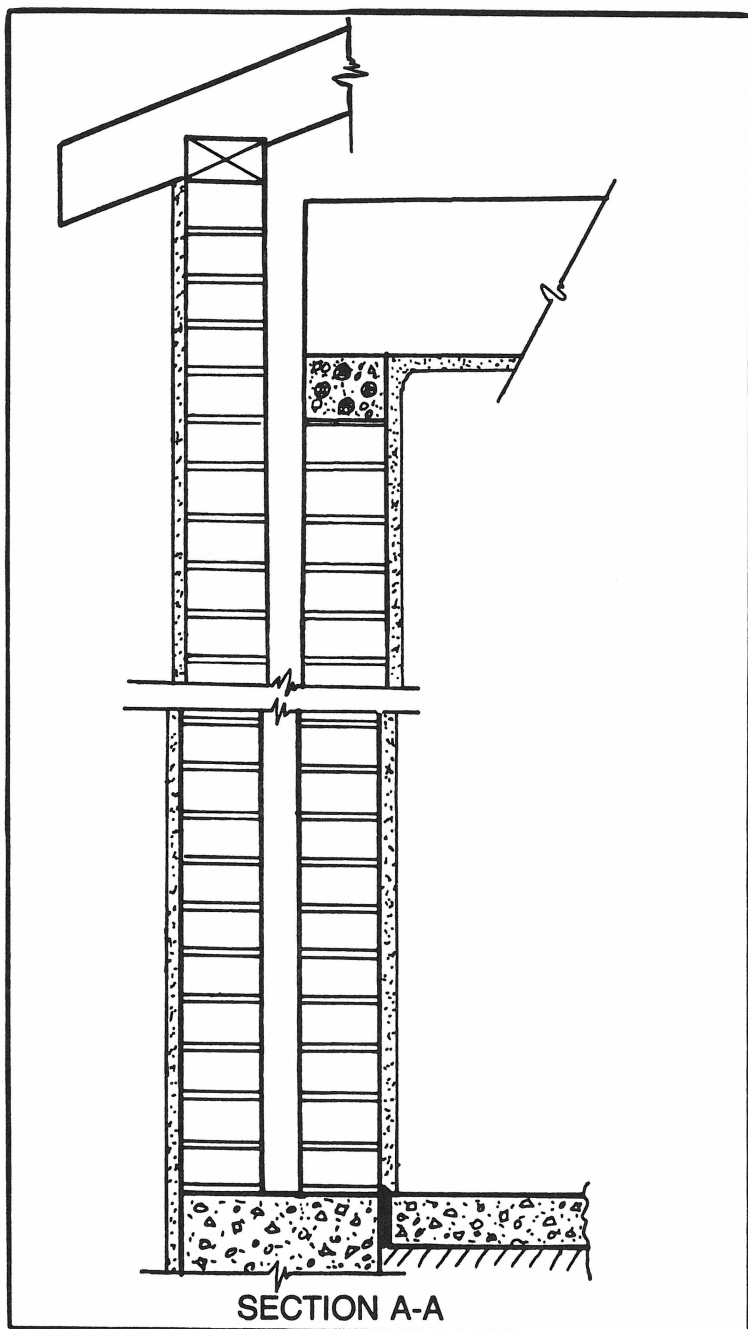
Studio wall construction of double tier brick, plastered inside and out. Section A-A specified in Fig. 8-1.
